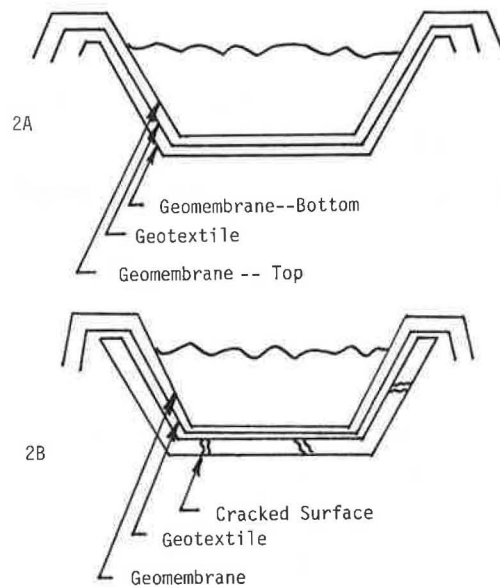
Installation of Geotextile in (A) Double-Lined Pond and (B) Rough Surfaced Pond.
